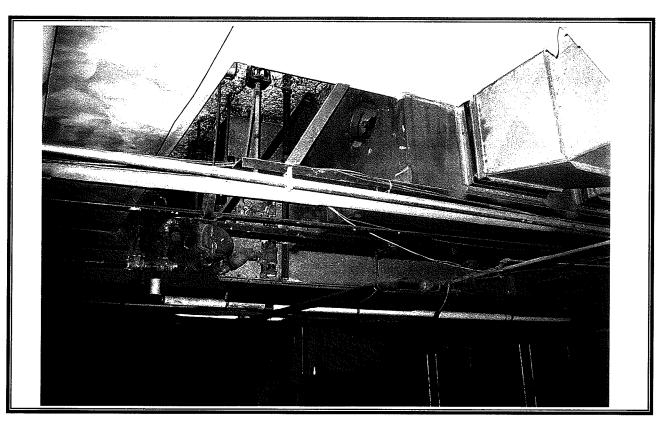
Photo Date 12/05/06 McCurdy Building Typical suspended air handling unit
